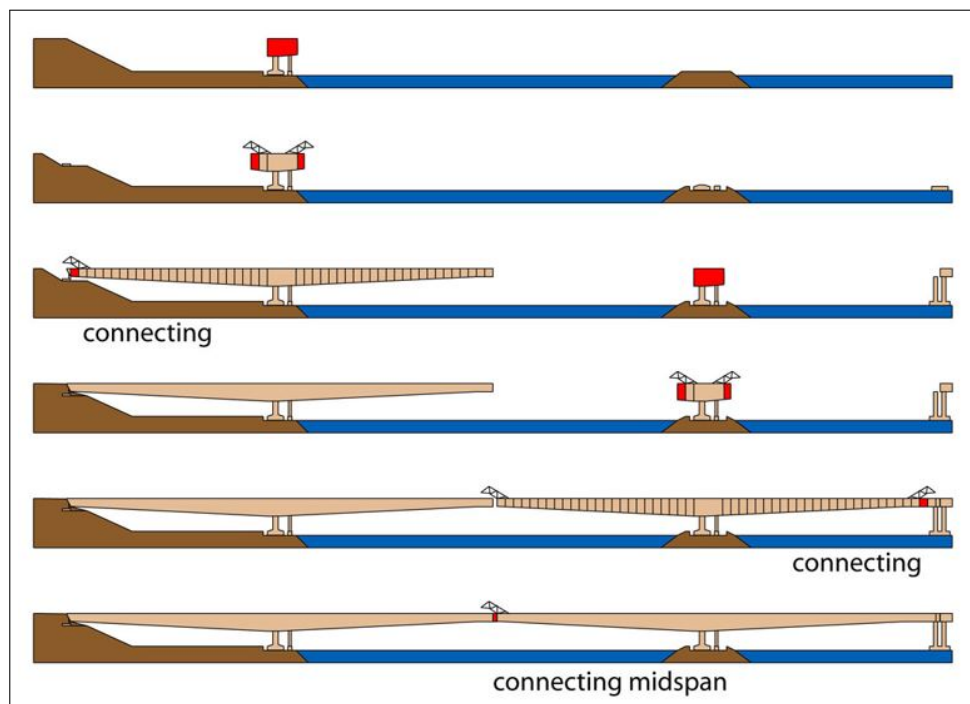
Building sequence of the balanced cantilever bridge. Source: Lecture slides CIE5127 Concrete Bridges [10]
